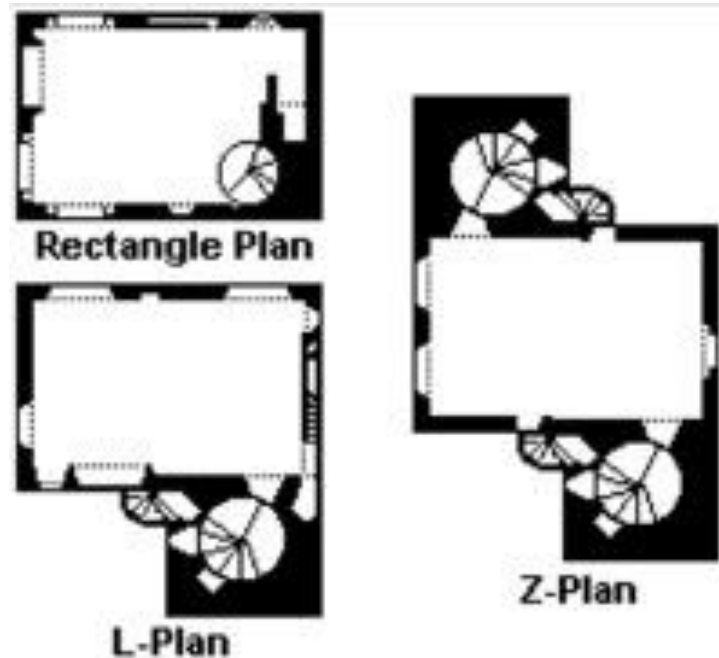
L-plan and Z-Plan sketches showing the layouts.
